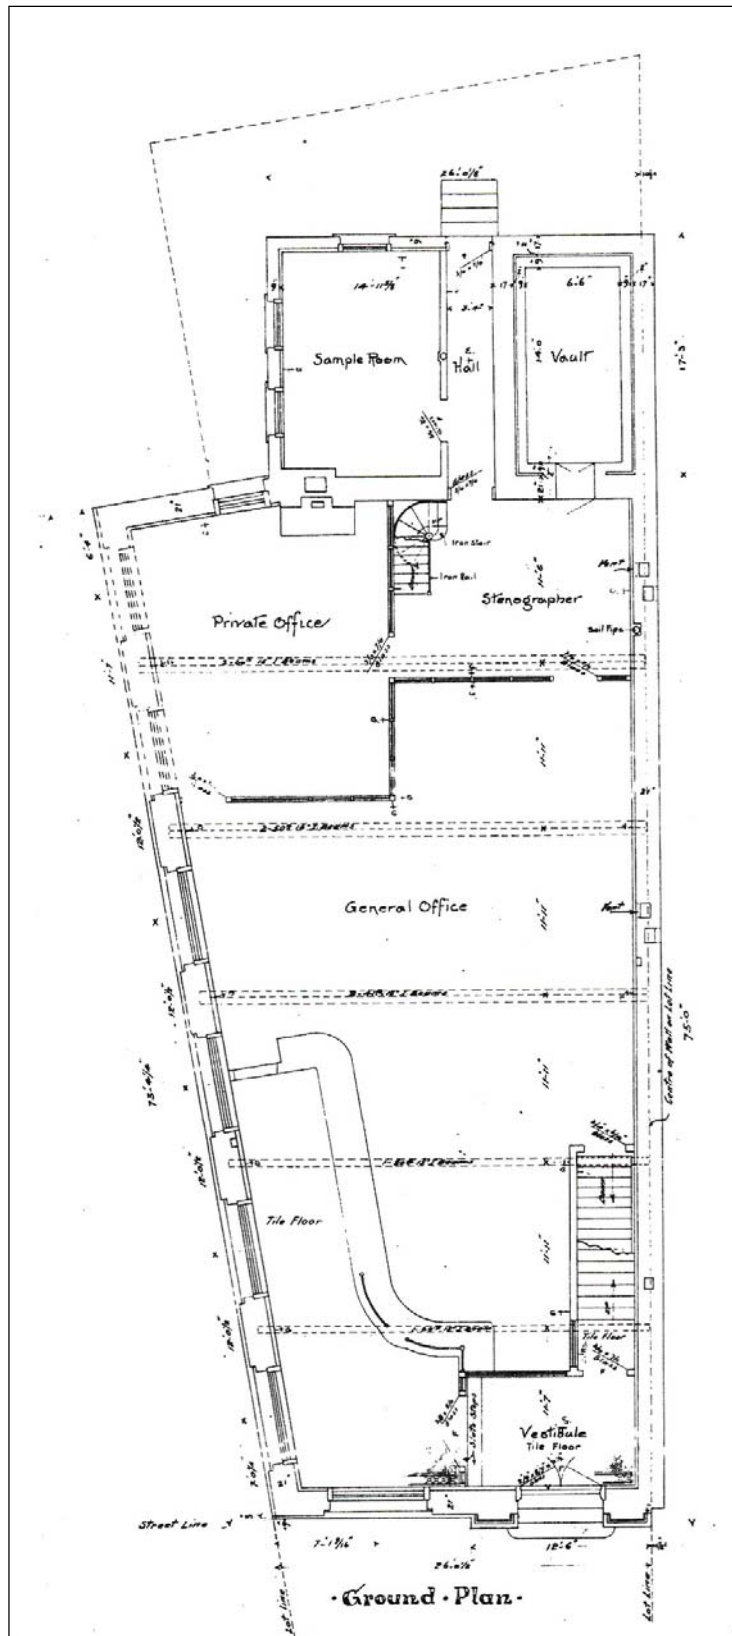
Architect’s Plans, “Ground Plan,” 1901. The rear section is small and only one storey high. The broken line at the rear of the building indicates the lot boundary. (Courtesy of the City of Winnipeg Archives, Plan #961/1901.)
